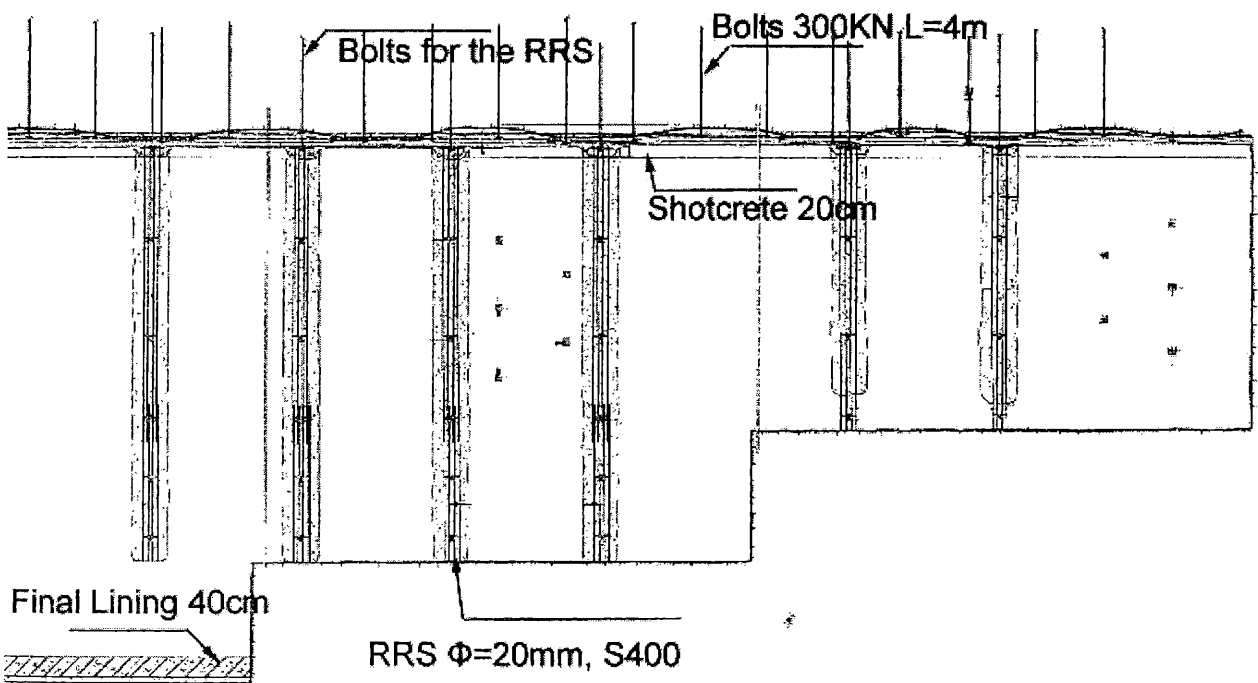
Excavation and primary support measures of the Mpozaitika tunnel; longitudinal section.
